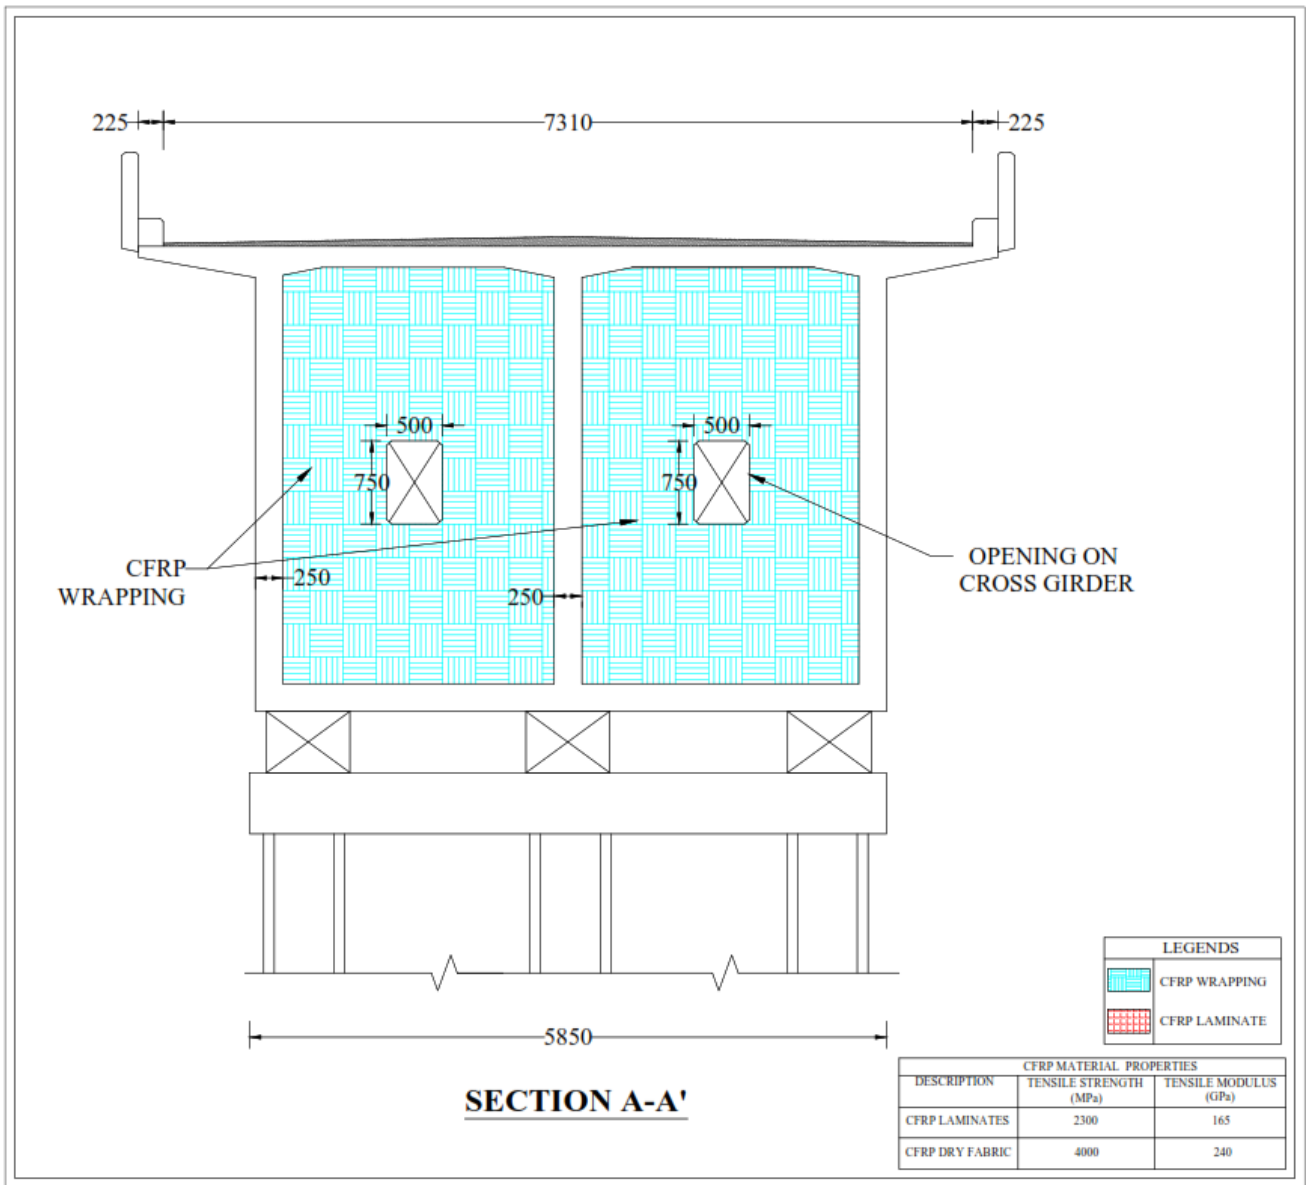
Strengthening of details of Diaphragm using 2 layers of CFRP fabric
